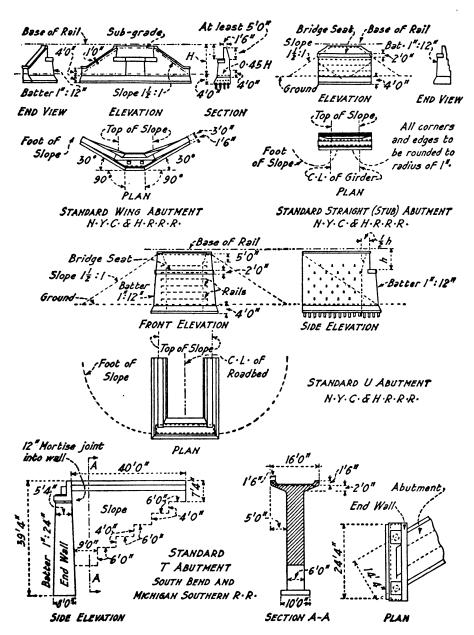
TYPES OF MASONRY ABUTMENTS.
